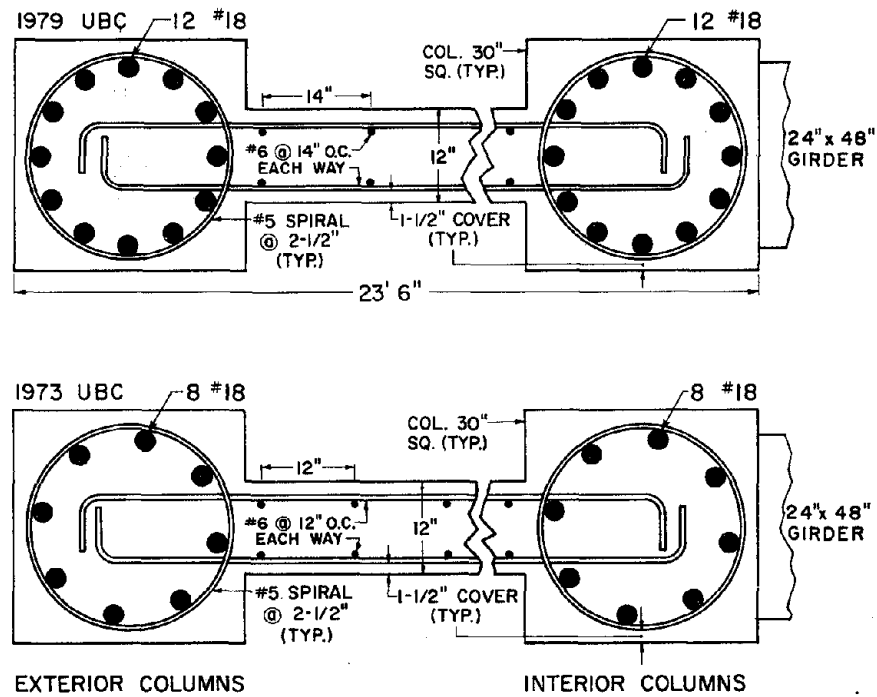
WALL CROSS SECTIONS DESIGNED BY UBC-73 AND UBC-79 PROVISIONS
